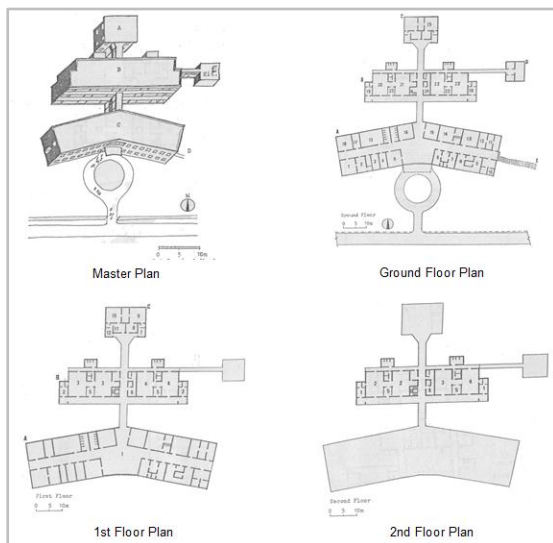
All Floor Plans of Hospital 'C' (Hussain, 1988).
